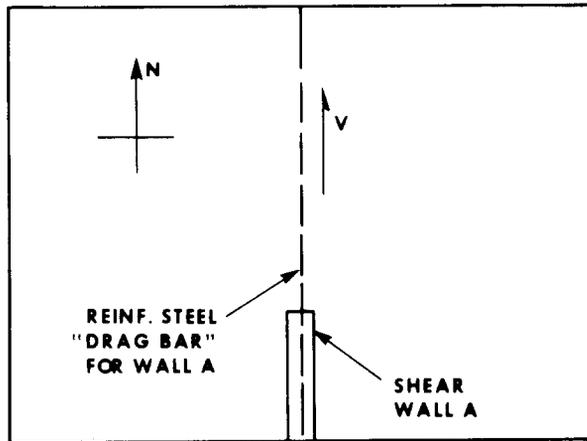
Plan of Building Showing Reinforcement Required to Collect the Shear in the Diaphragm into the Partial Shear Wall
